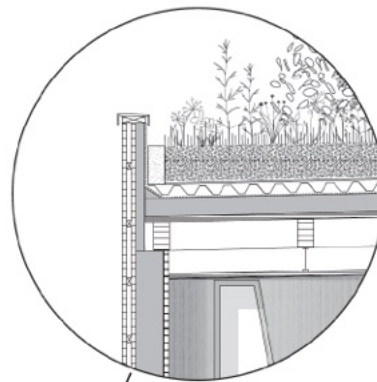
Outside facade structure - connection between interior and exterior 1:200
